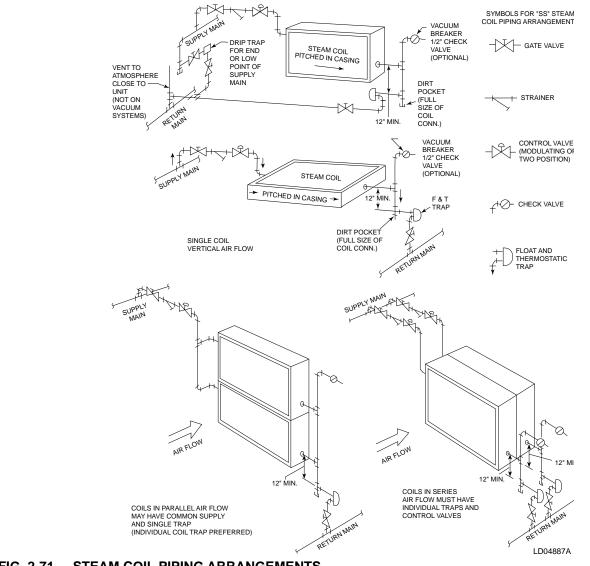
STEAM COIL PIPING ARRANGEMENTS
